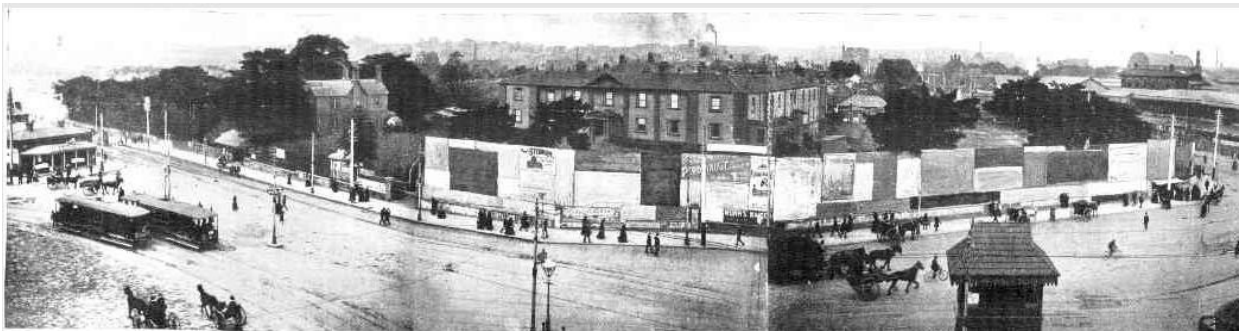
Site of Central Station, corner of Devonshire and Pitt Streets, showing buildings about to be demolished—view taken from the roofs of the Grand Hotel and A Saunder's Jewellery Establishment, George Street. Benevolent Asylum in centre of view behind hoarding.
